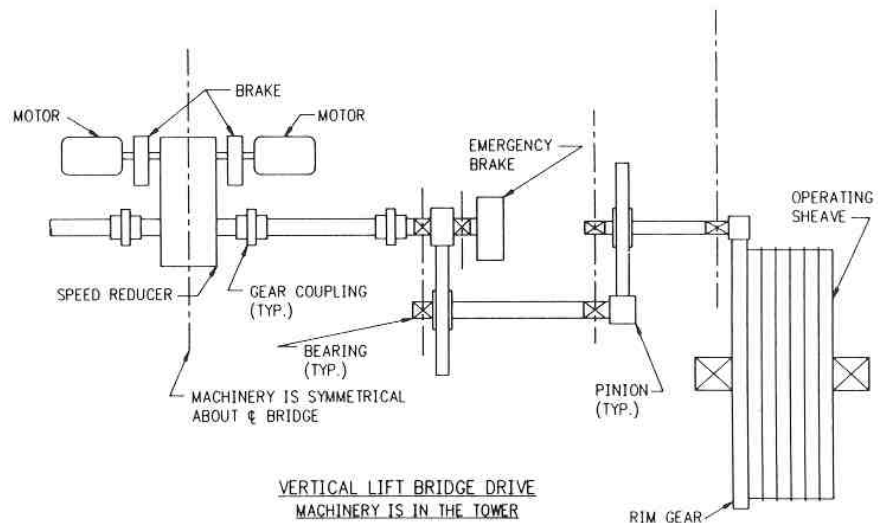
Vertical Lift Bridge Machinery is Located on the Towers, and the Rim Gears (and Operating Sheaves) are Rotated to Raise and Lower the Bridge
